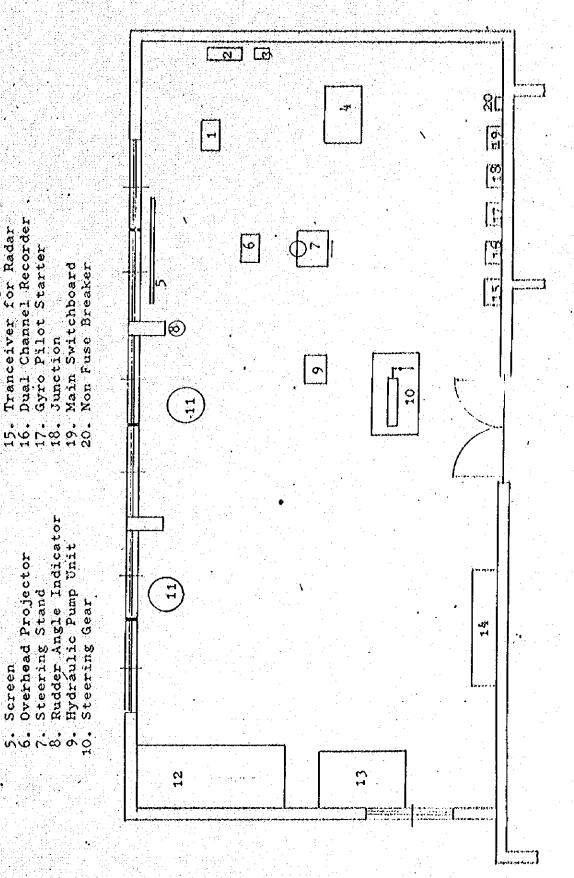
Plan of SSTC Educational Building (2nd Floor)
